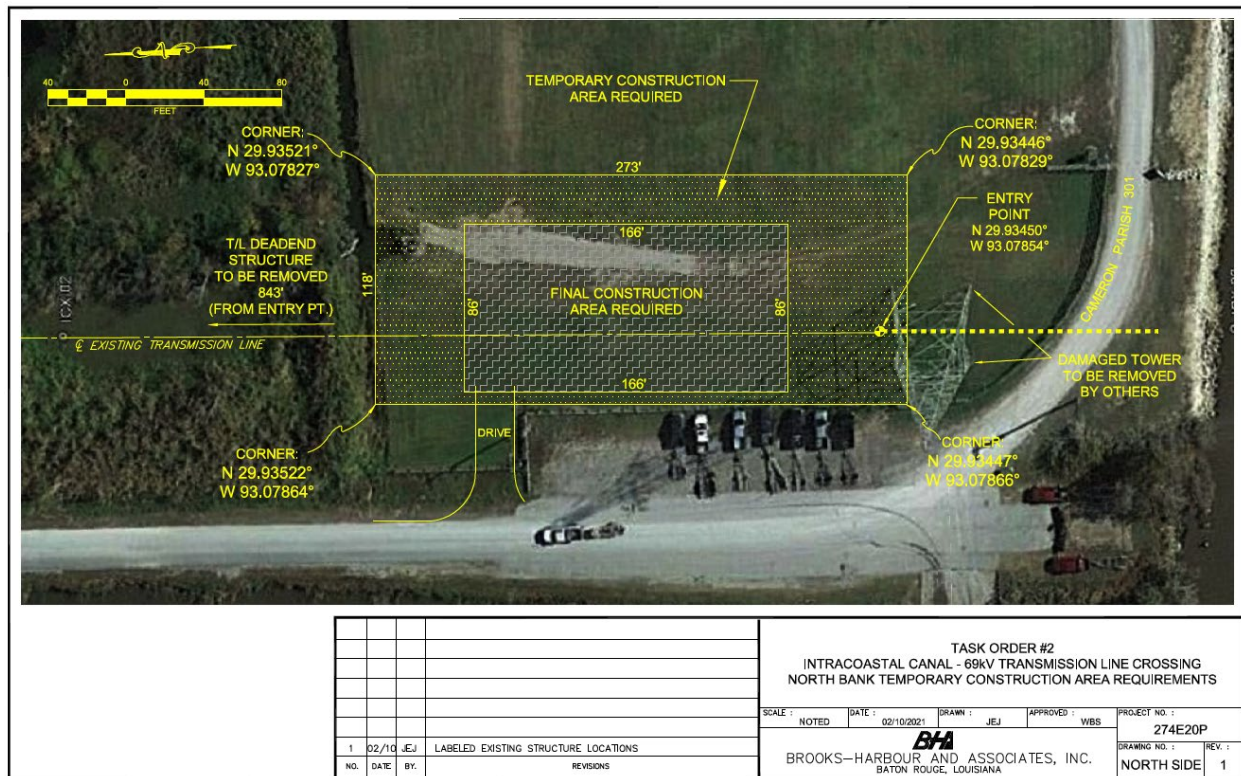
69kV Transmission Line GIWW Crossing North Bank Temporary Construction Area Requirements.
